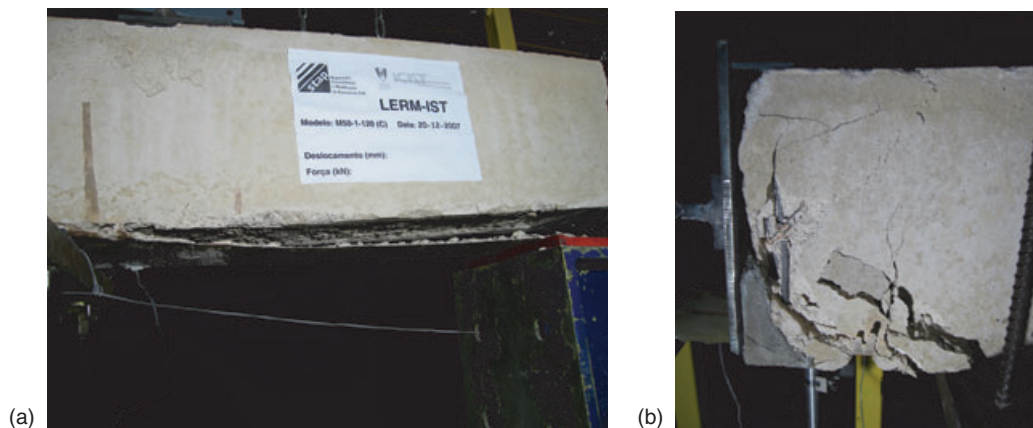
(a) GFRP debonding after the anchorage (D failure); (b) Masonry crushing (C failure)
